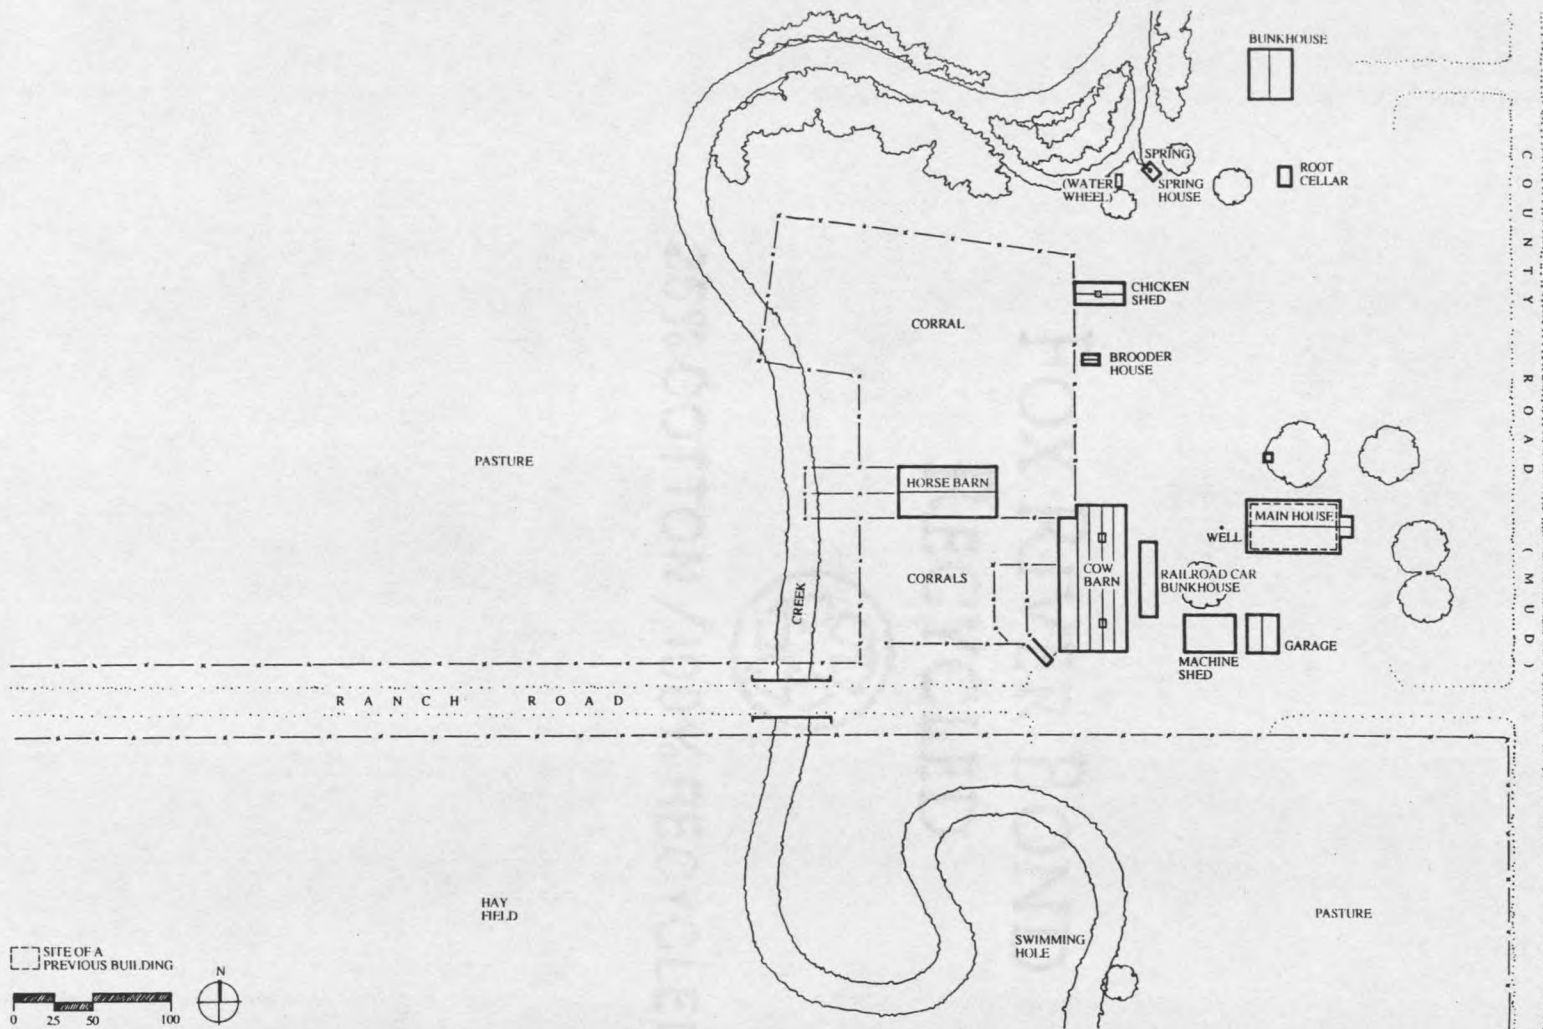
Site #2 - Site plan from 1931 to 1955. A new house was built on the site of the previous one after it burned down, and a bunkhouse was built, in addition to other new outbuildings. In all five new structures were built, one was moved onto the site, another was moved off.
